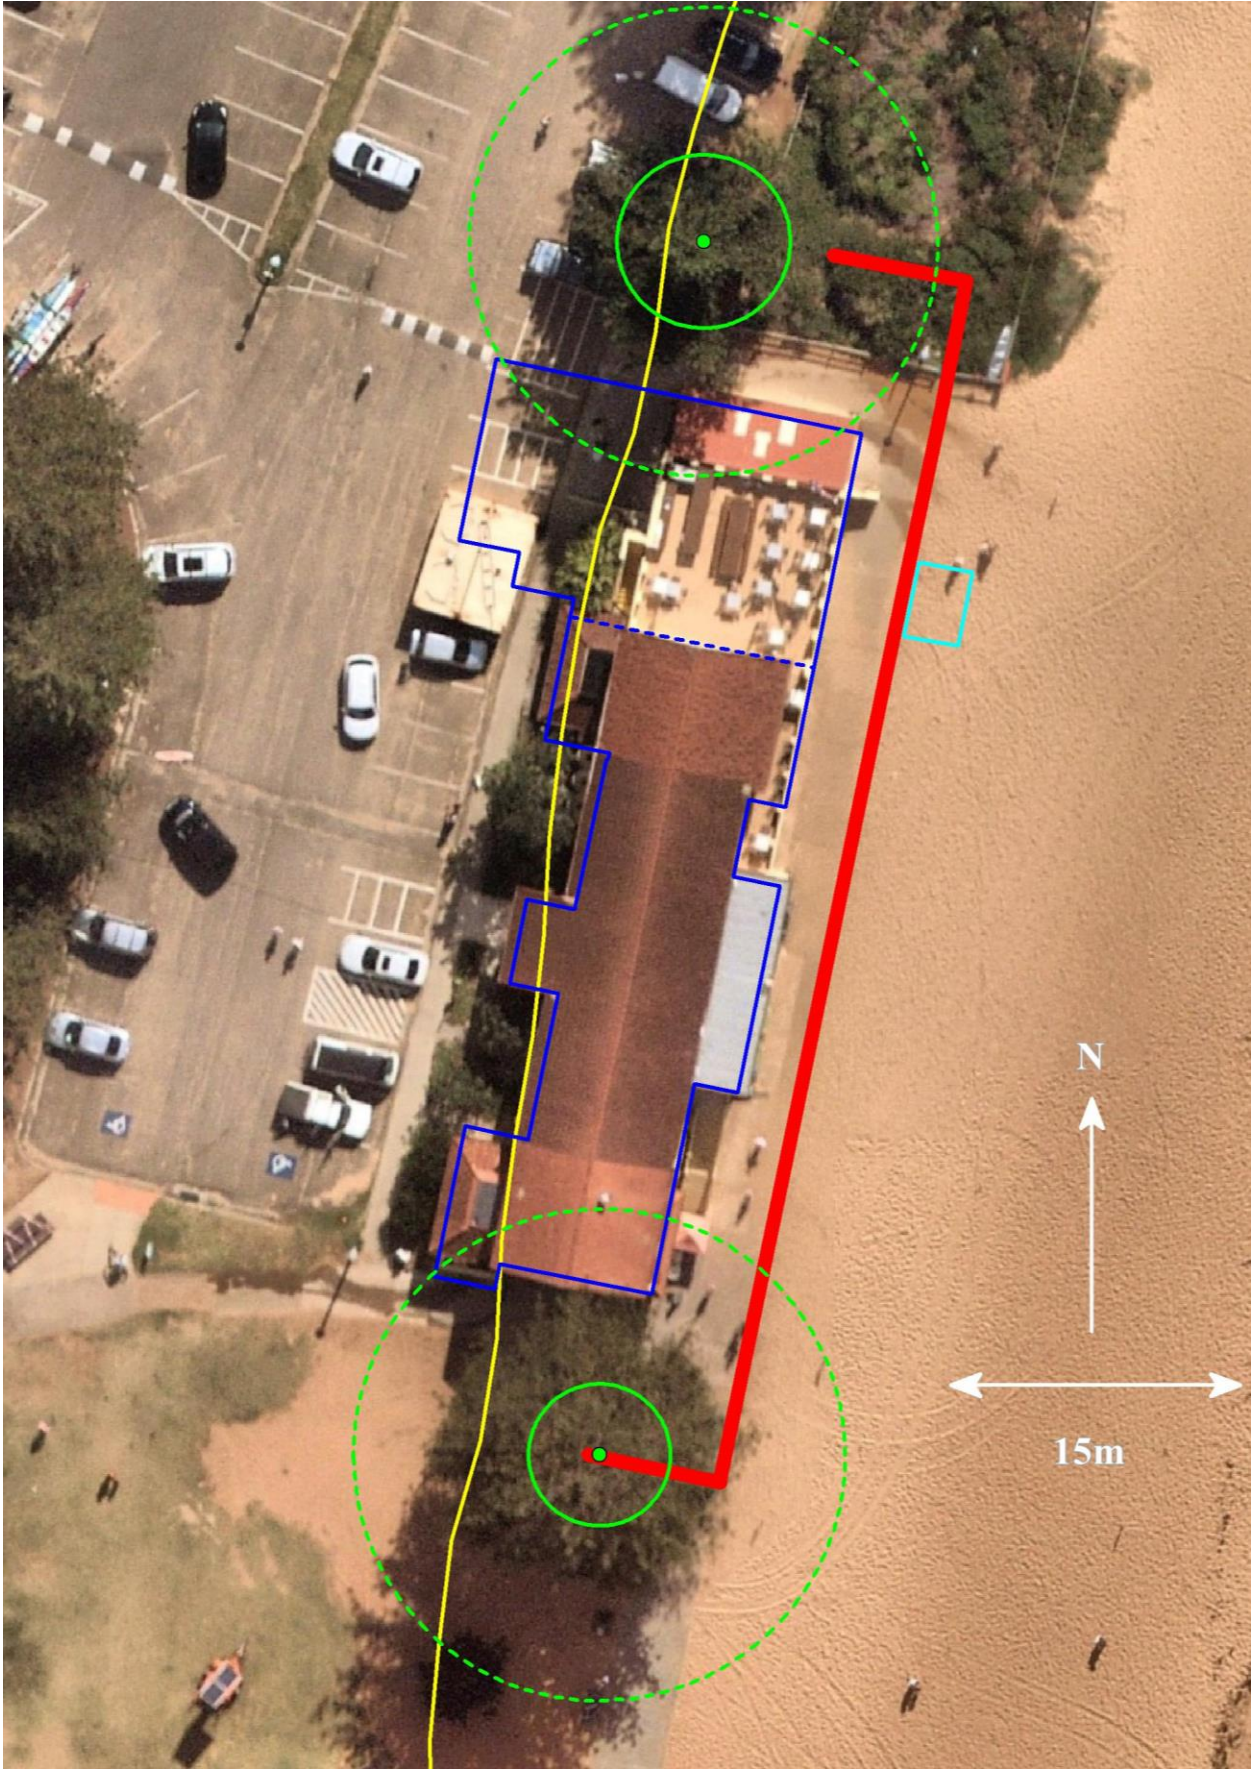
Option 1 – seawall extent for no piling of new clubhouse, with seawall at seaward edge of existing concrete path, without significant returns
